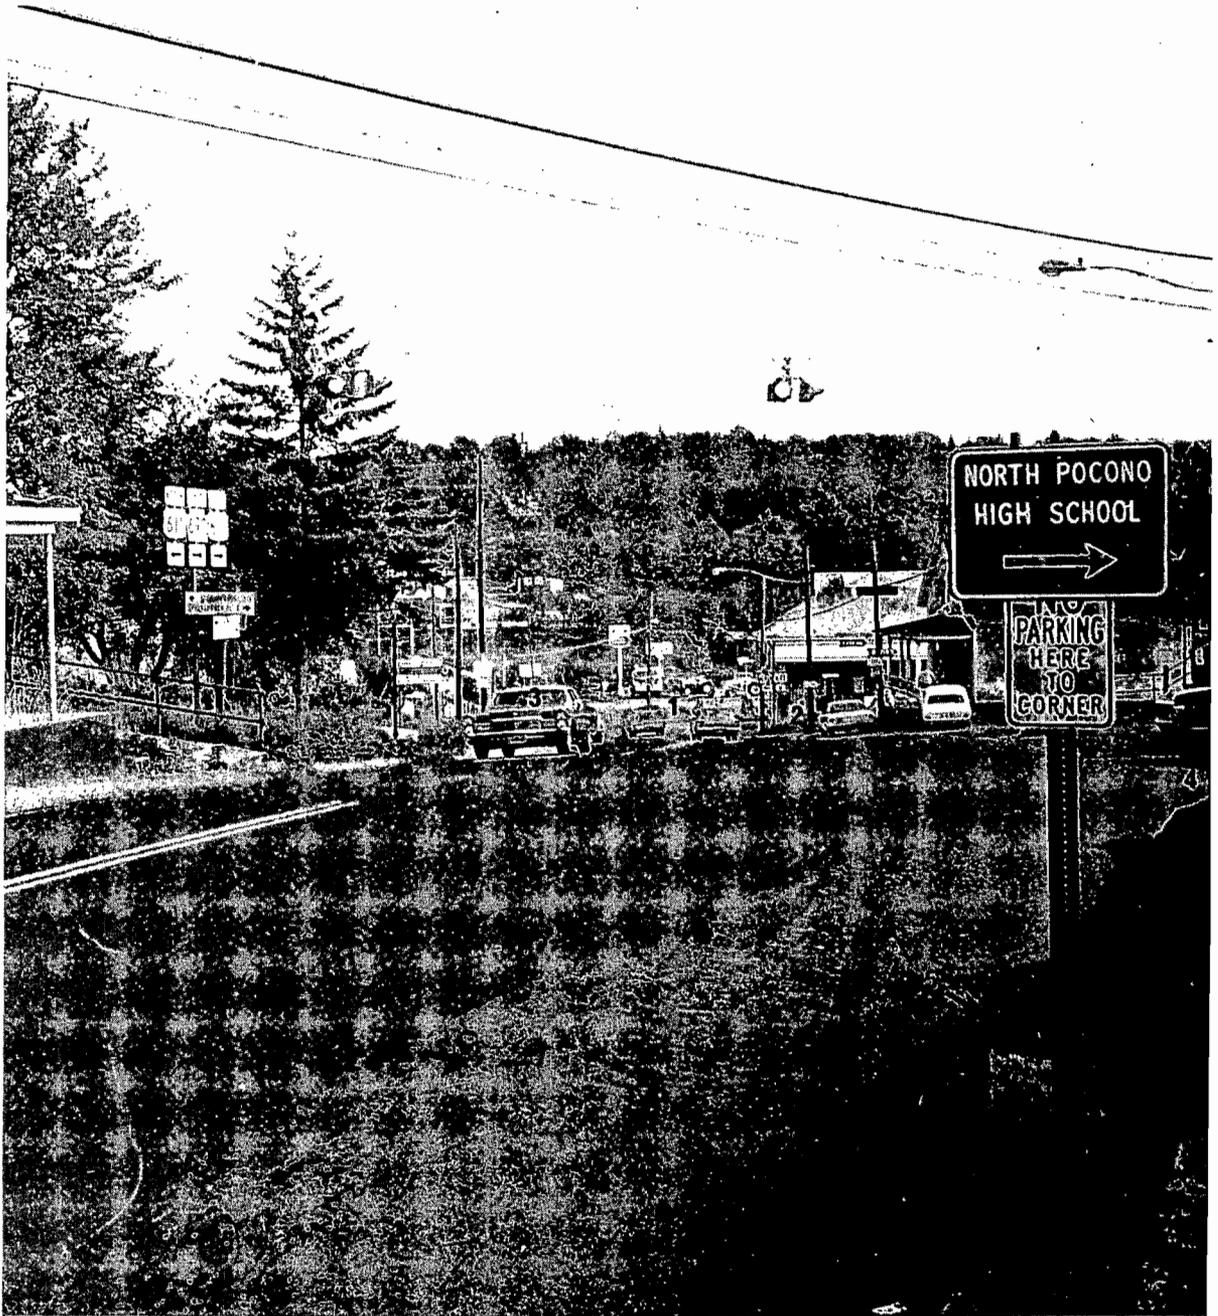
U.S. Route 611 (picture taken 700 feet south of the impact point facing south).
